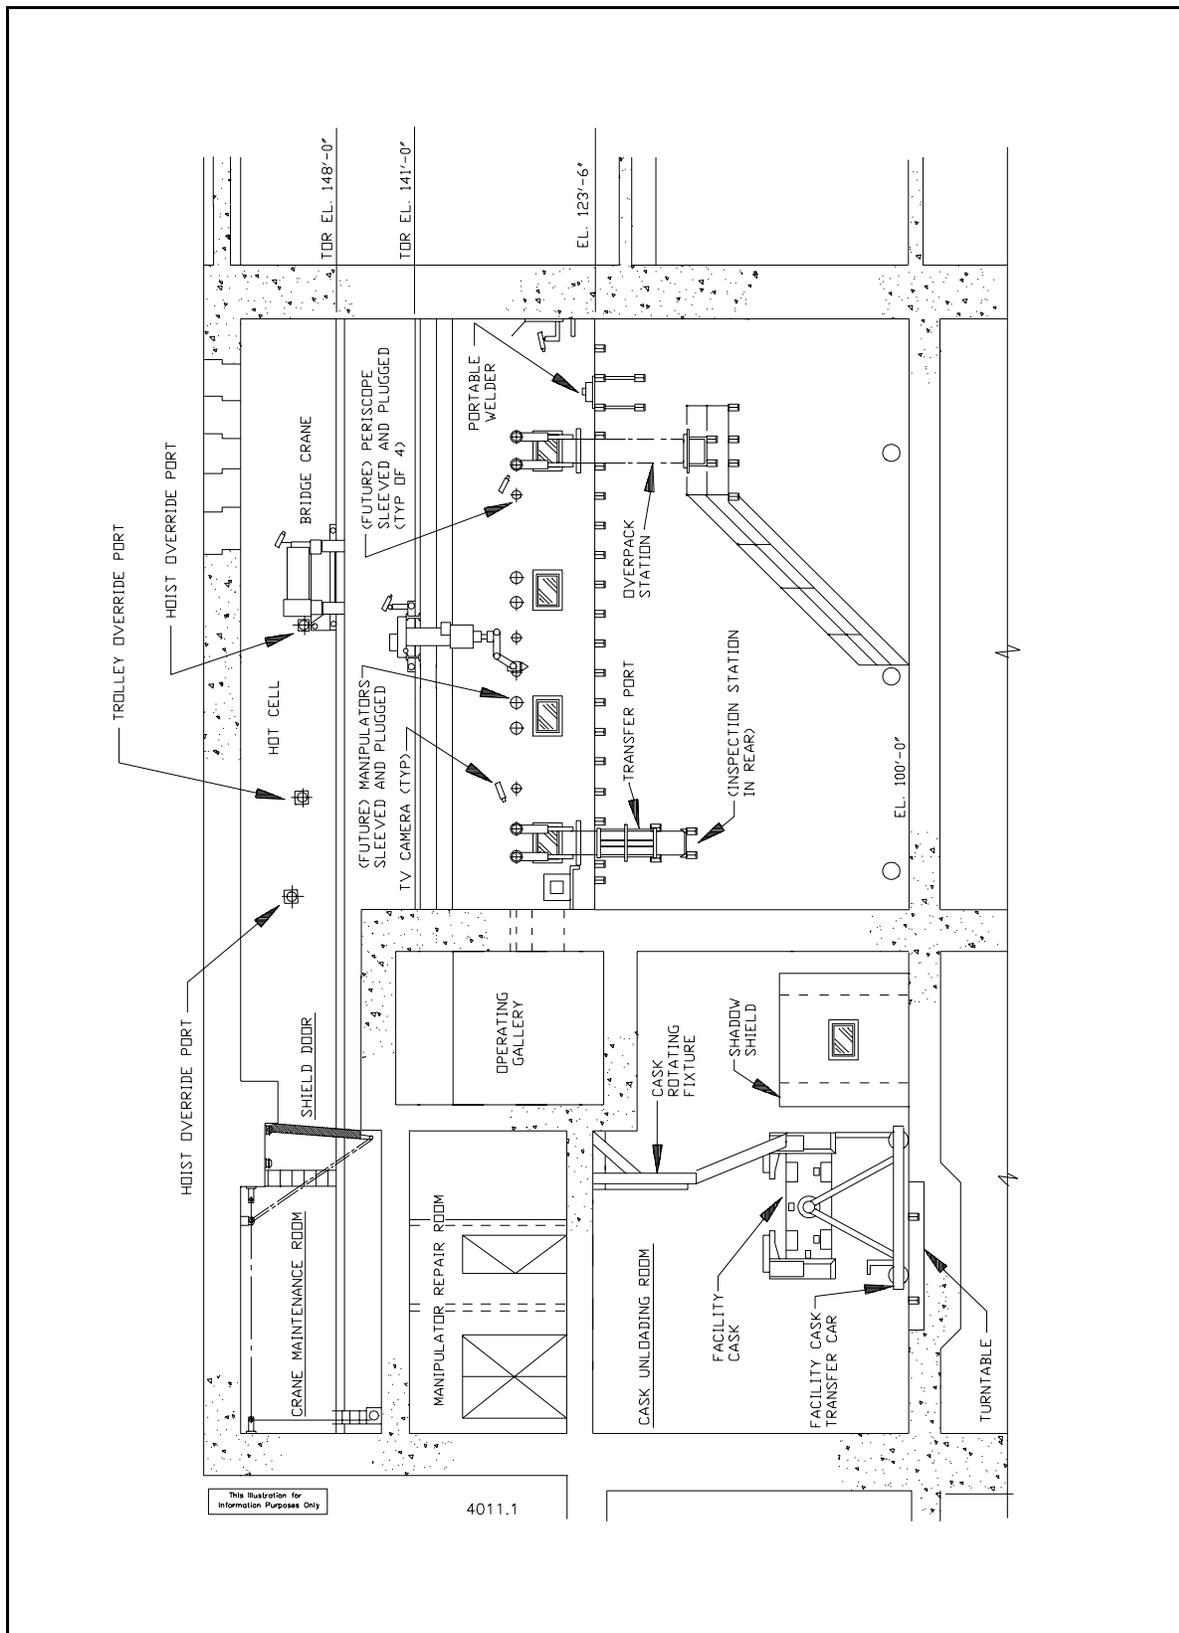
, Details of Hot Cell Cross Section at D-D
